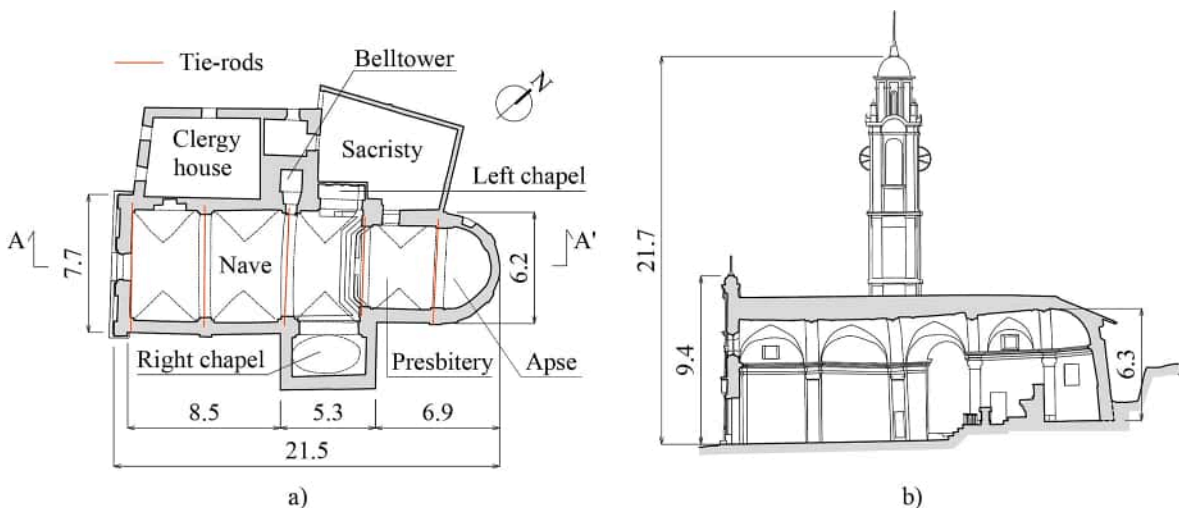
Geometry of San Carlo Borromeo church: a) plan, b) section AA'.
